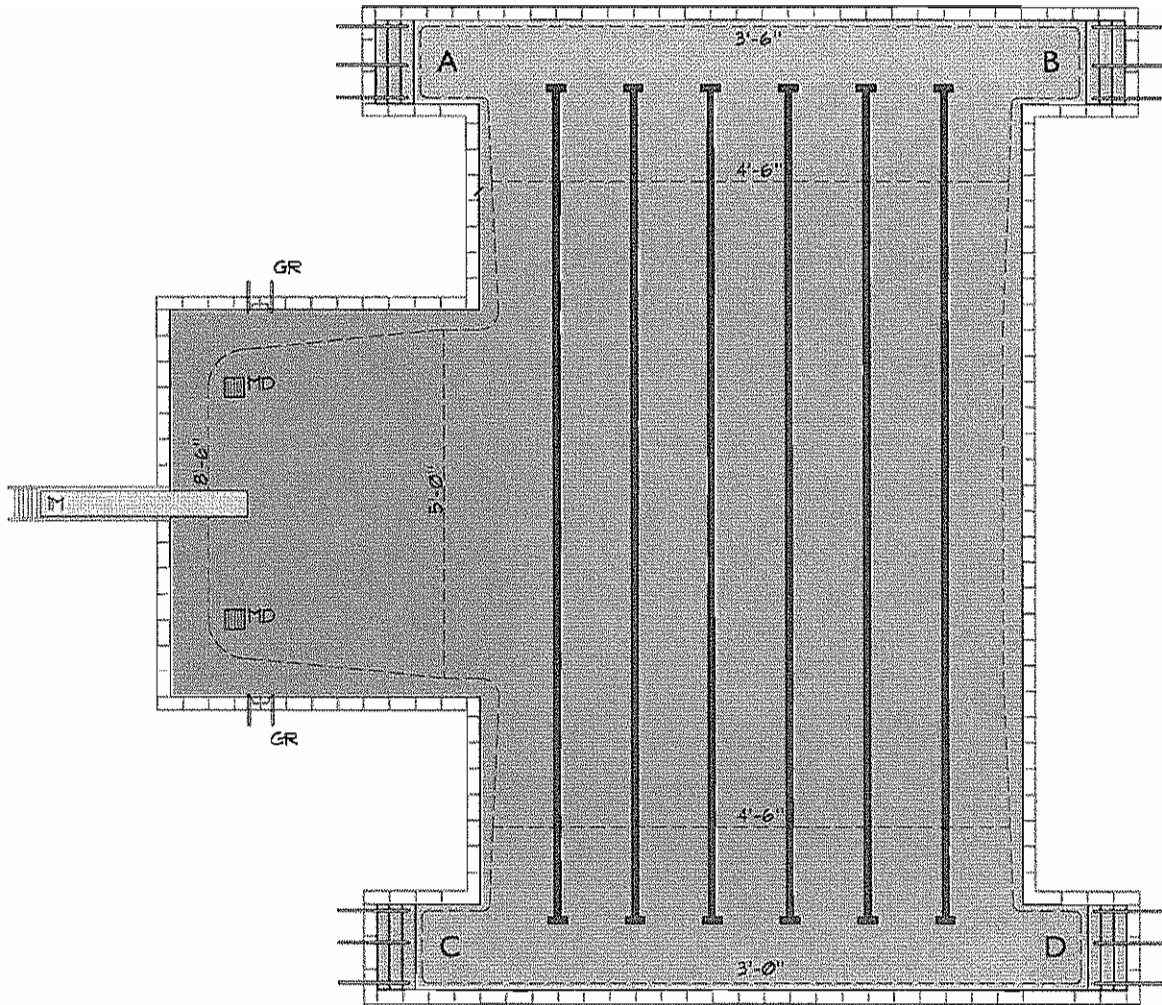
SWIMMING POOL WALK-OUT STAIRS
